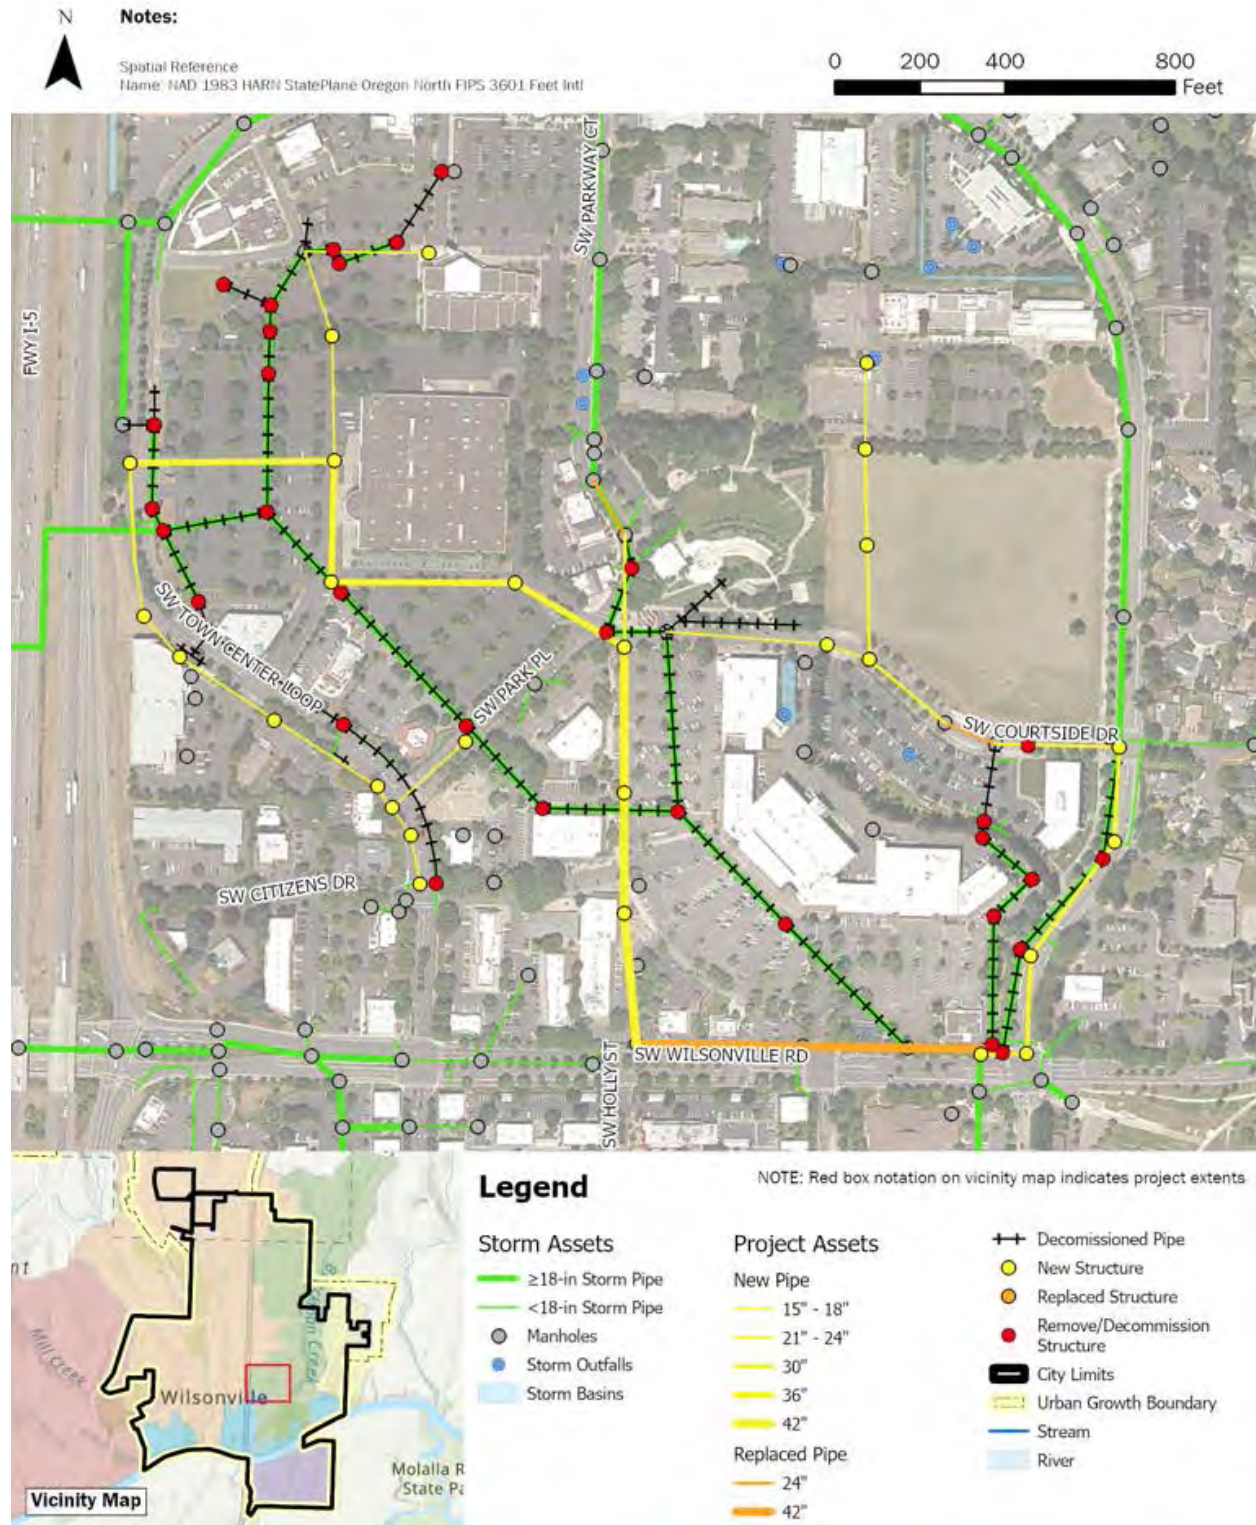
Town Center Stormwater Infrastructure Proposal
